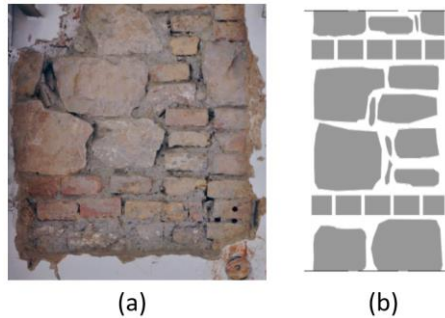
Direct investigation: a) front of Masonry Class A3 - Group Ib ; b) cross sections
